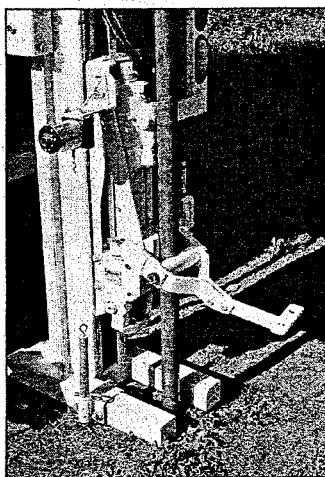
Outer casing may be retrieved with a pull cap or rod grip pull system if the probe hole is sealed with granular bentonite.
